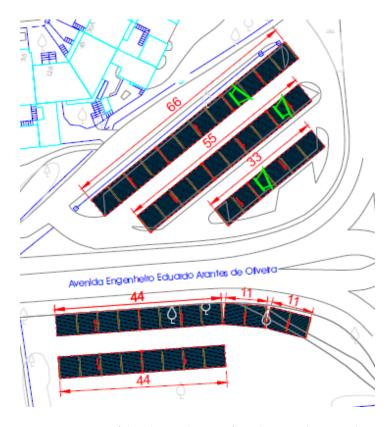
Layout of the photovoltaic roofs with Tegosolar PV to be installed in the parking lot.
